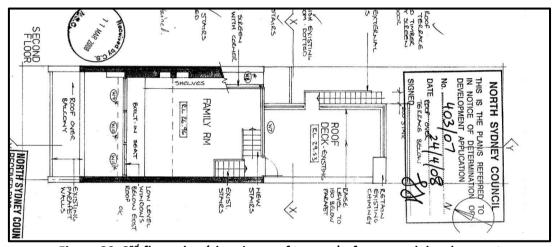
2<sup>nd</sup> floor plan (showing roof terrace) of approved development
